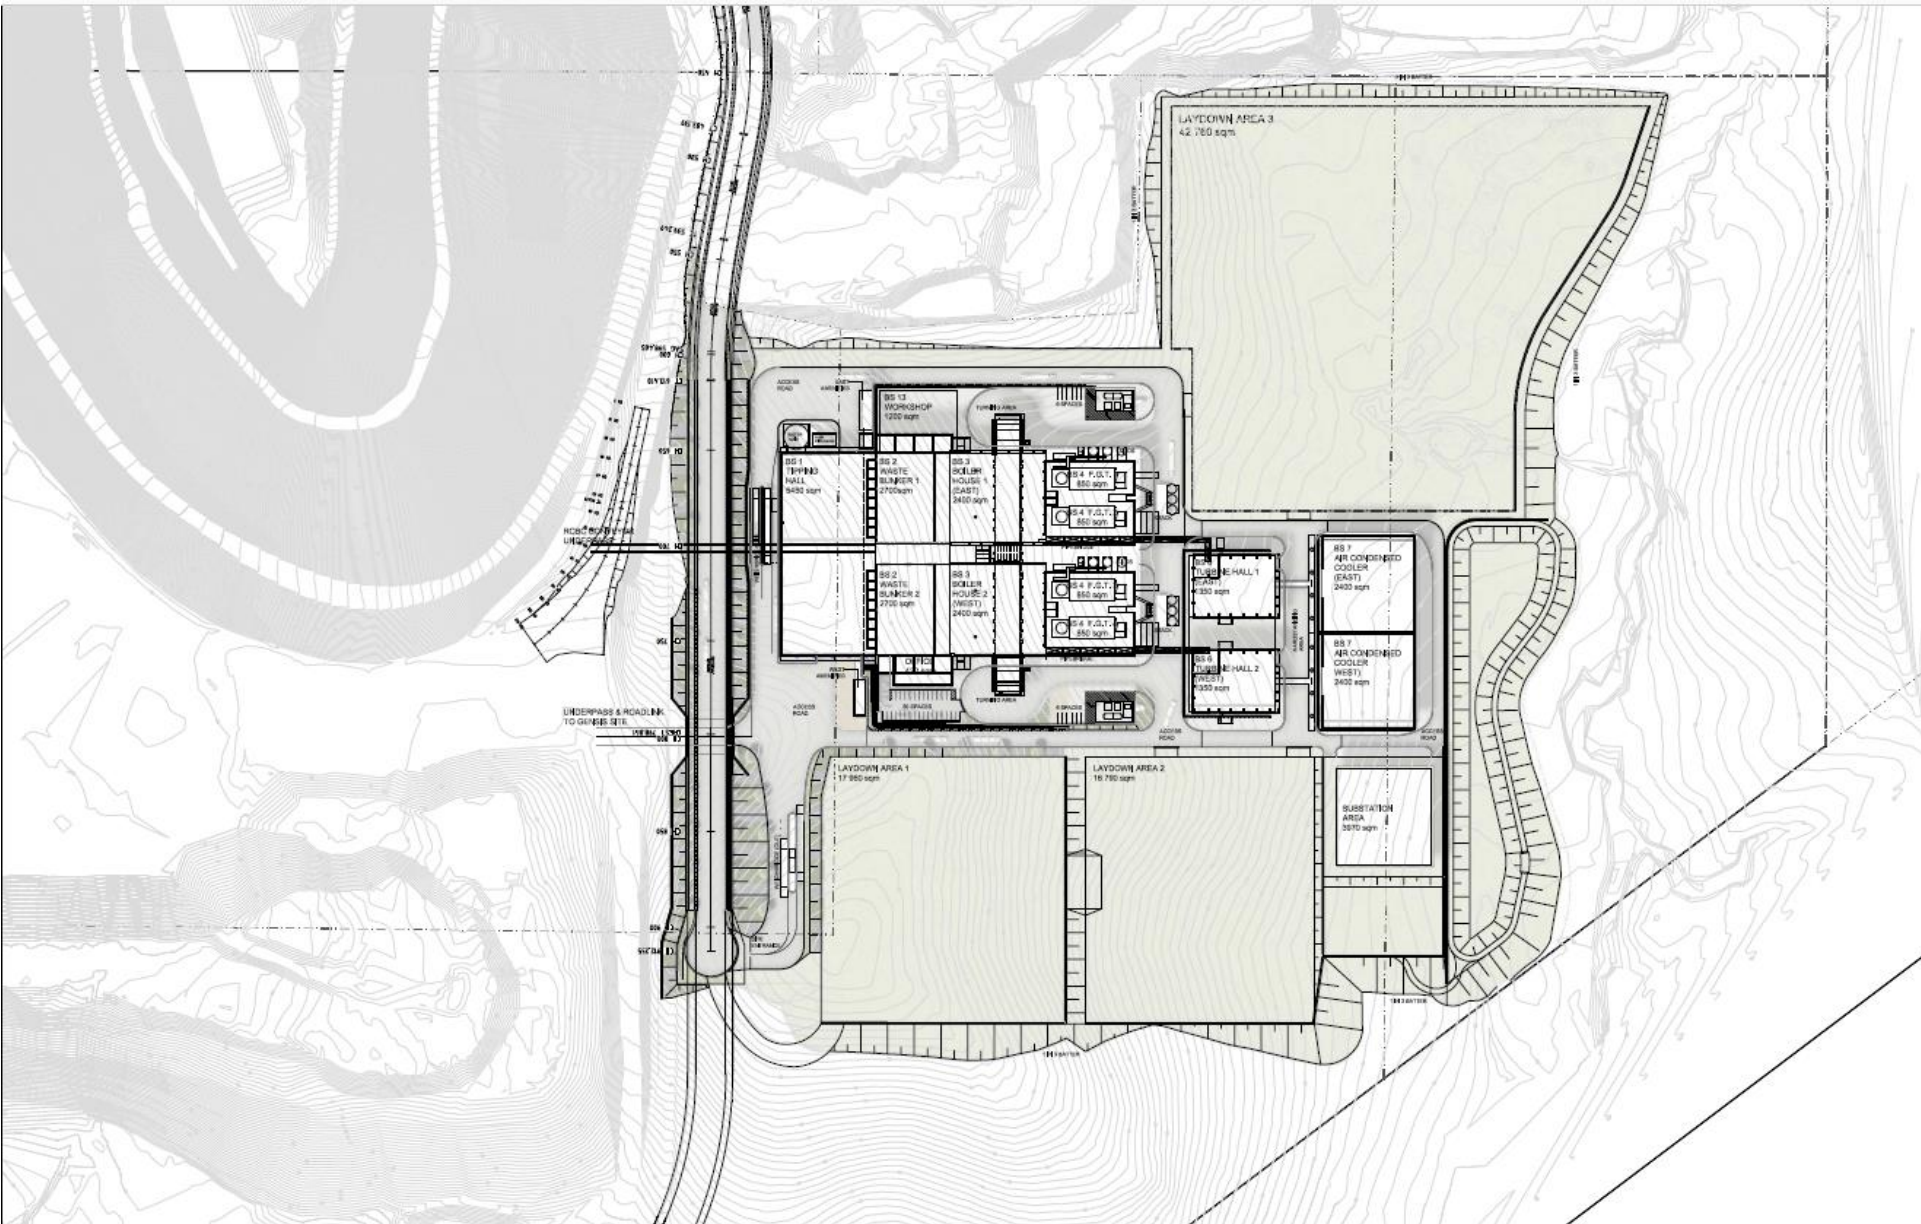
Building layout and use (source: Krikis Taylor Architects, 2015)
